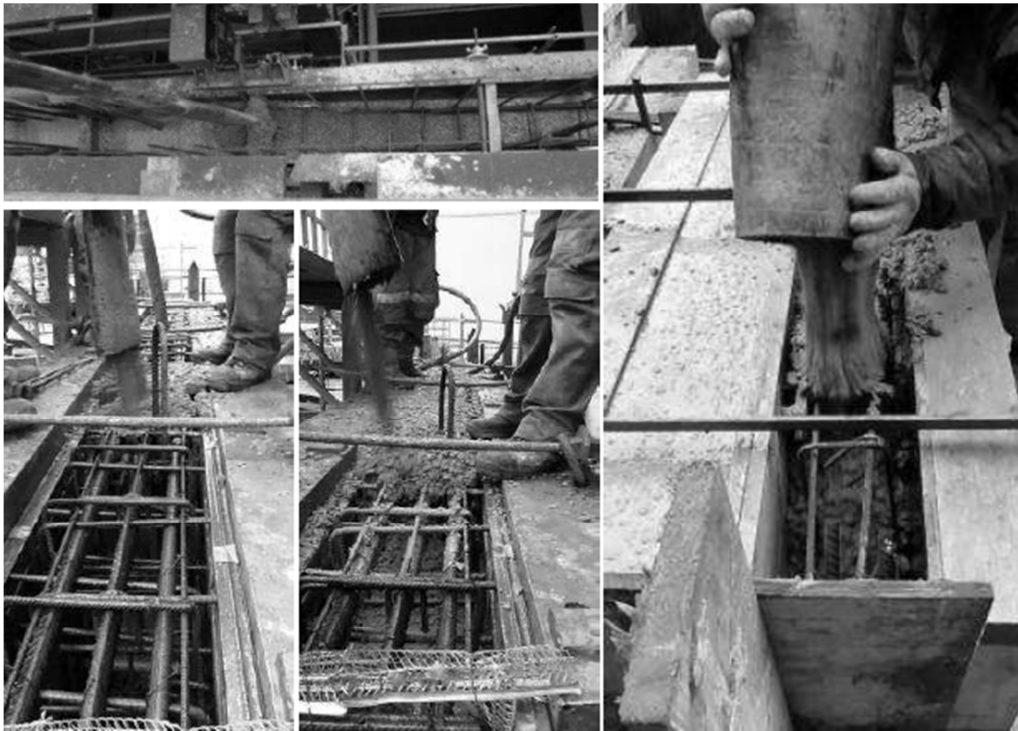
Concreting at the construction site of a R+10 type building in (Bonapriso).
